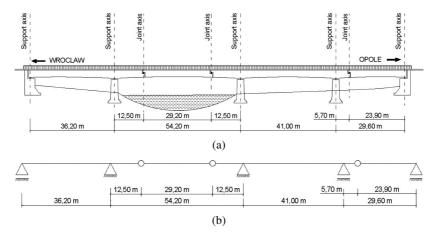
Road bridge over Wrocławska Street in Opole: (a) view of the structure from the downstream side, (b) static scheme of the bridge [own elaboration]
